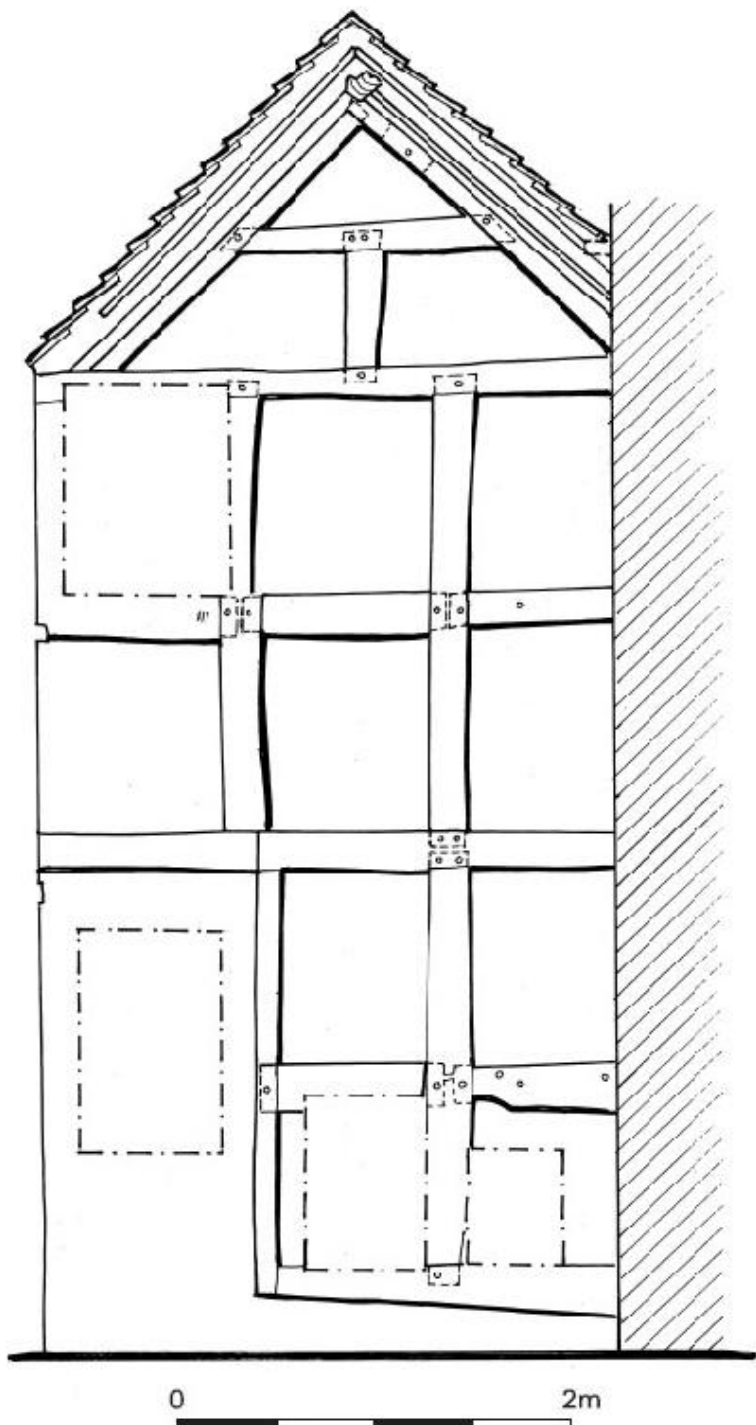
The gable elevation of the stair tower in the angle between the hall and northern service cross-wing of Pool Farm
